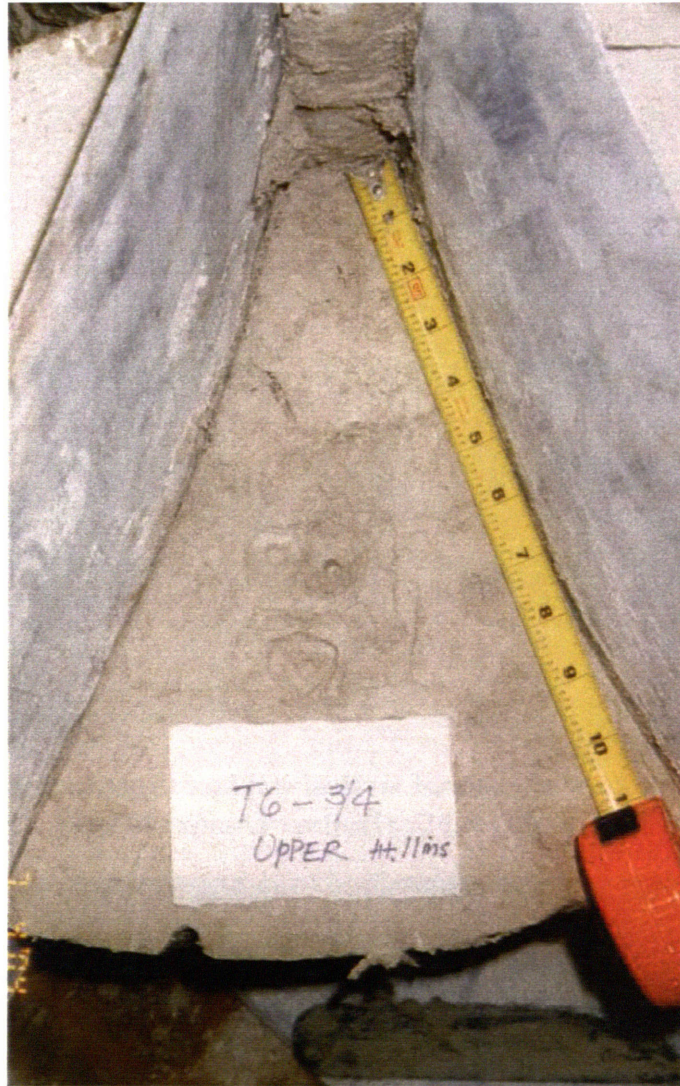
(e). View of exposed vertical soil face (Specimen T6, Section 6)
